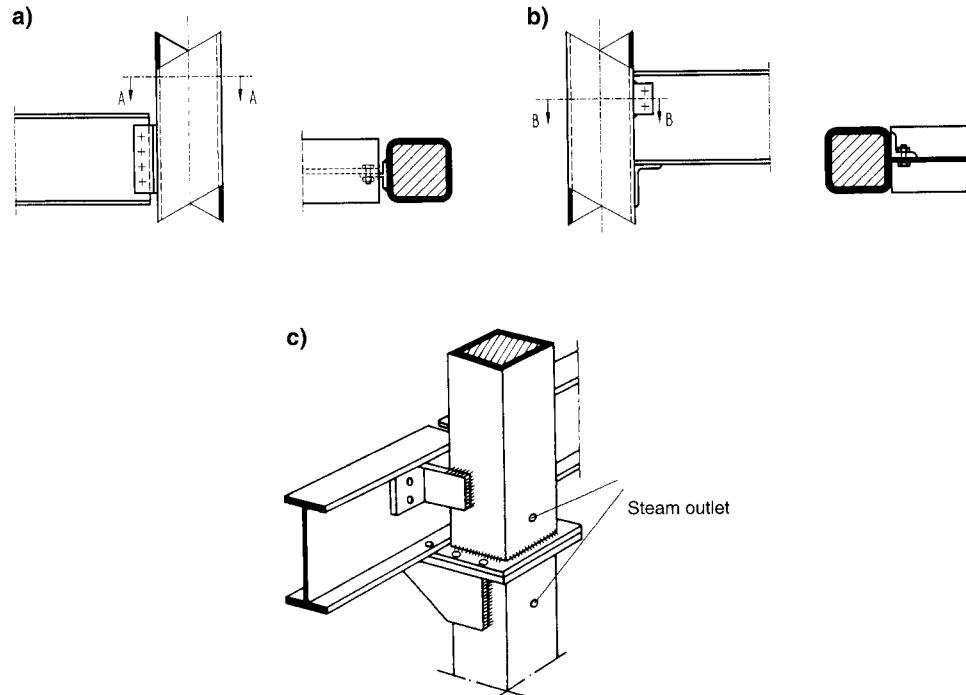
Beam to composite column shear connections a) tee section welded to column face and then joined to beam web by bolting b) angle welded to column face and then joined to beam web c) an eccentric connection
